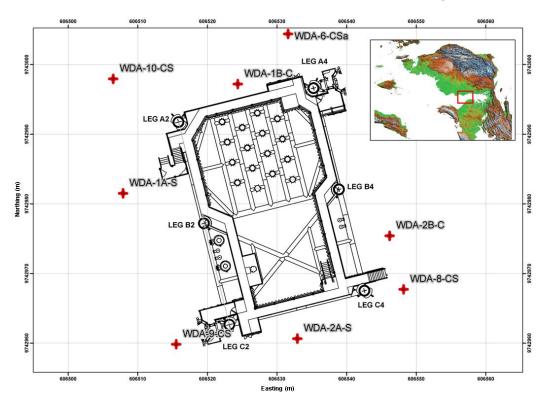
WDA Platform Plan View and Sample / PCPT Borehole Locations
